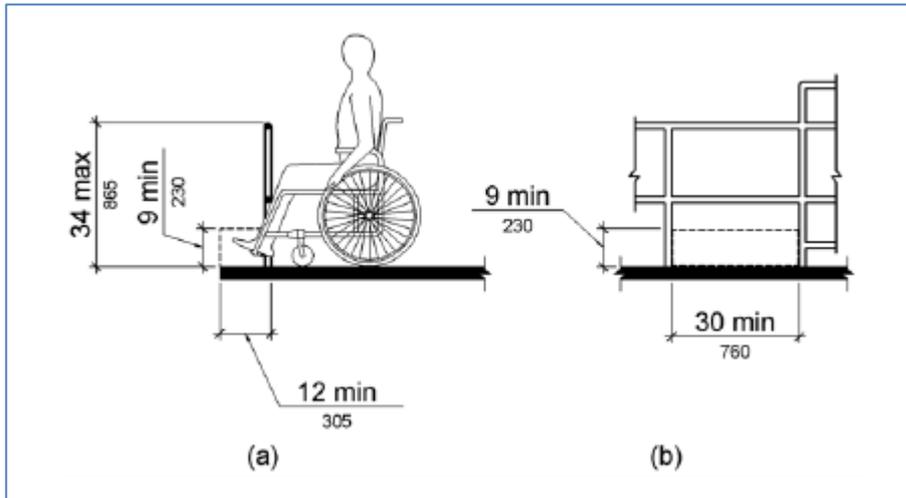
ADA Standards Extended Ground or Deck Surface at Fishing Piers and Platforms
